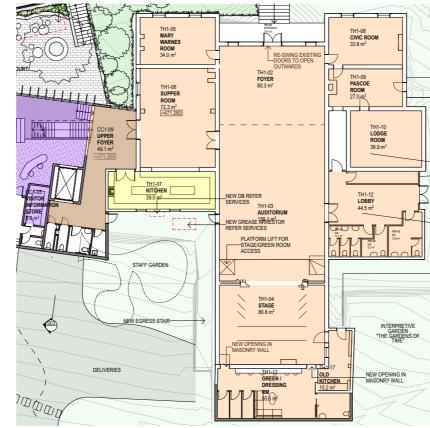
PROPOSED TOWN HALL REFURBISHMENT
